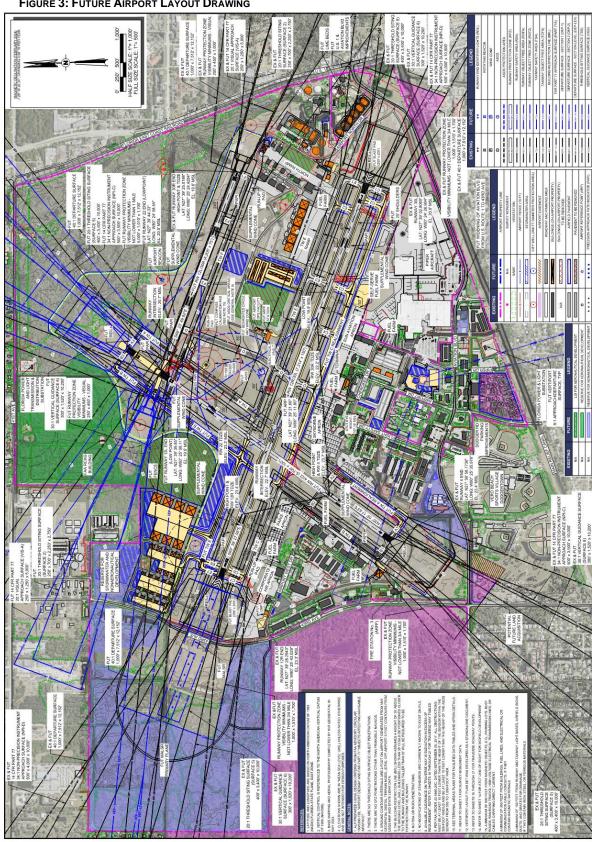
FUTURE AIRPORT LAYOUT DRAWING
